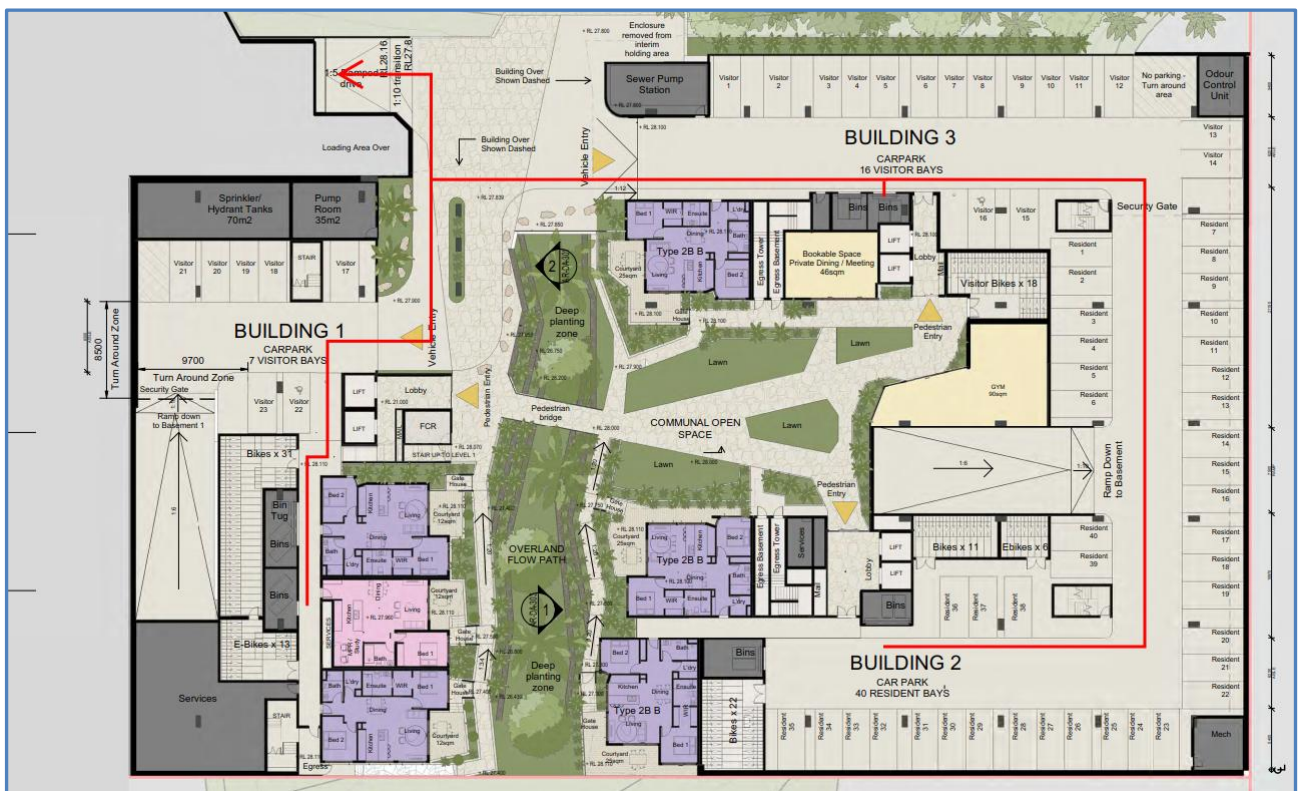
Refuse Transfer (Buildings 1 – 3)
